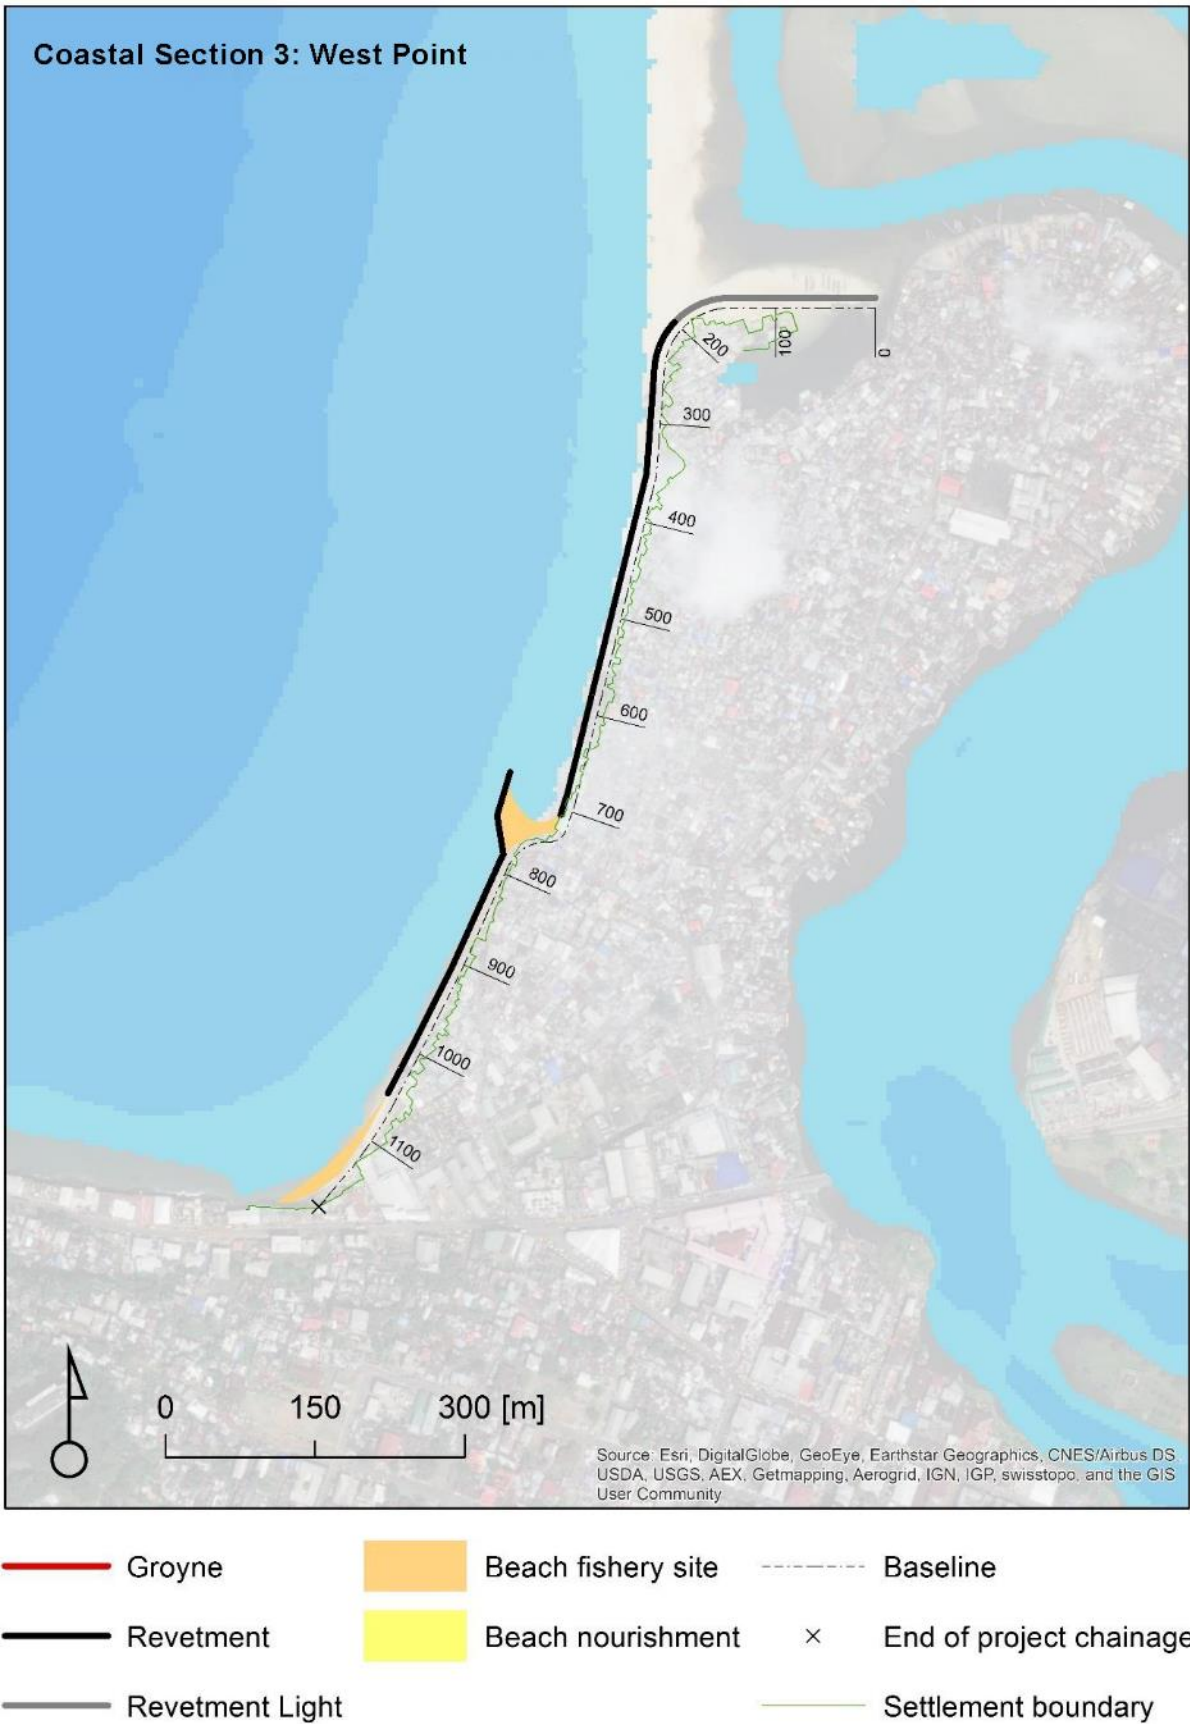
Overview of the proposed West Point protective structures and fishing landing beaches (adapted from CDR International, 2019b)
